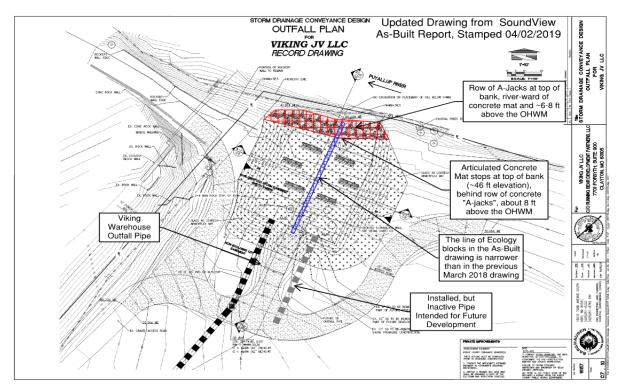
Adapted Plan View of As-Built Changes from the Originally Approved Outfall Structure Design
